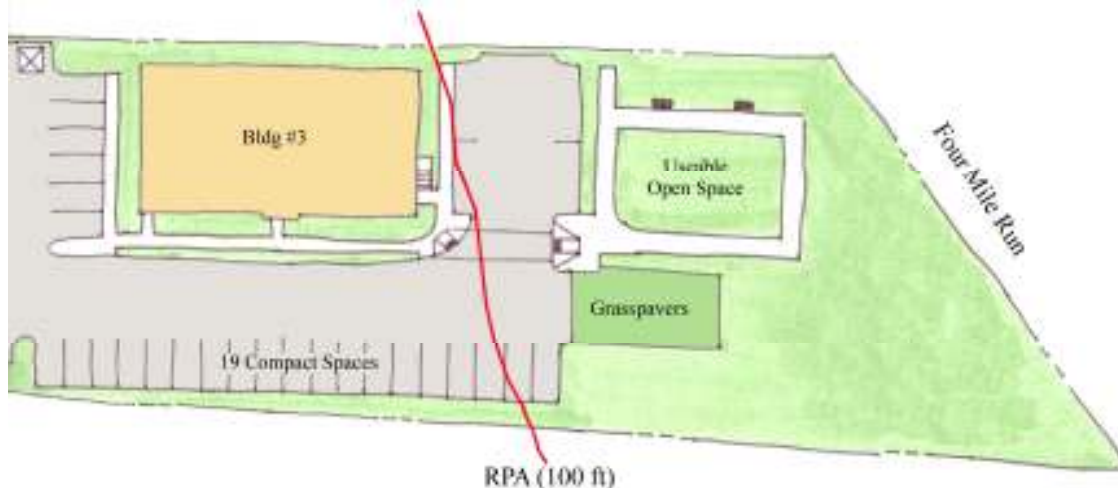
WEST GLEBE – Staff Recommended Parking & Open Space Design
